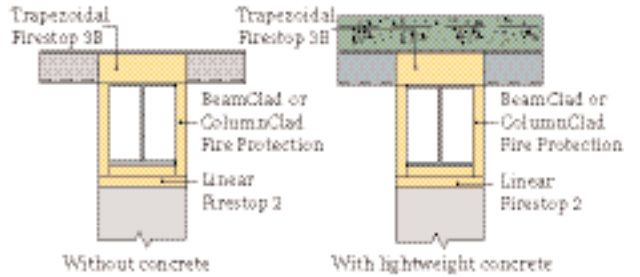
Profiled metal deck with or without lightweight concrete over universal beam
